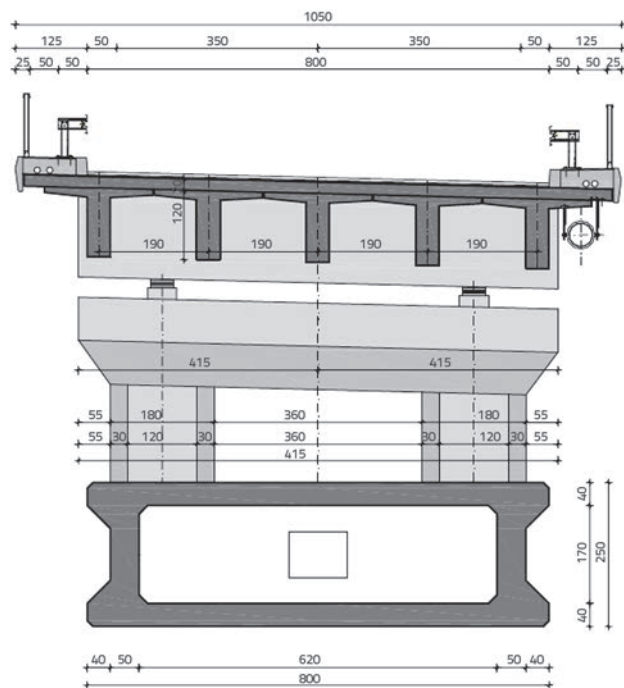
Arch and superstructure cross sections at Cetina River Bridge [8]
